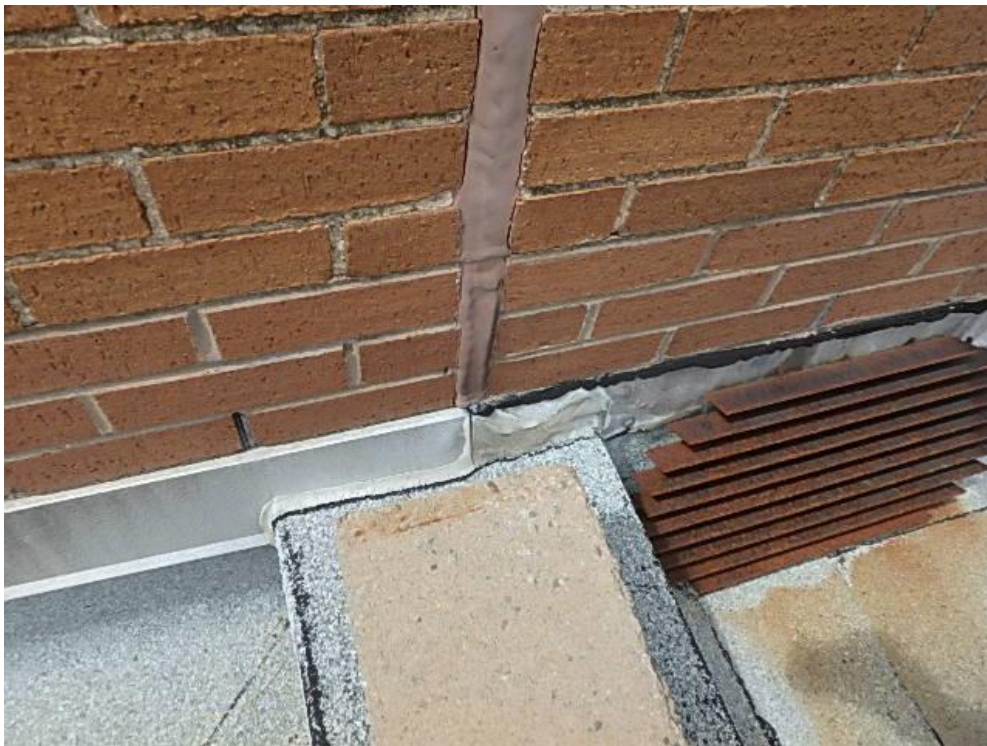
Roof Area 1.1. Metal stairs and landing with rust staining of unprotected membrane below.
